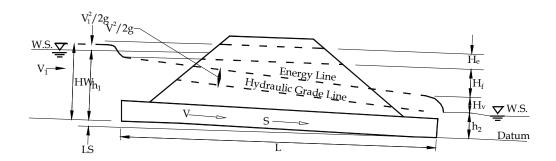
Hydraulics of Culvert Flowing Full under Outlet Control for High Tailwater.
